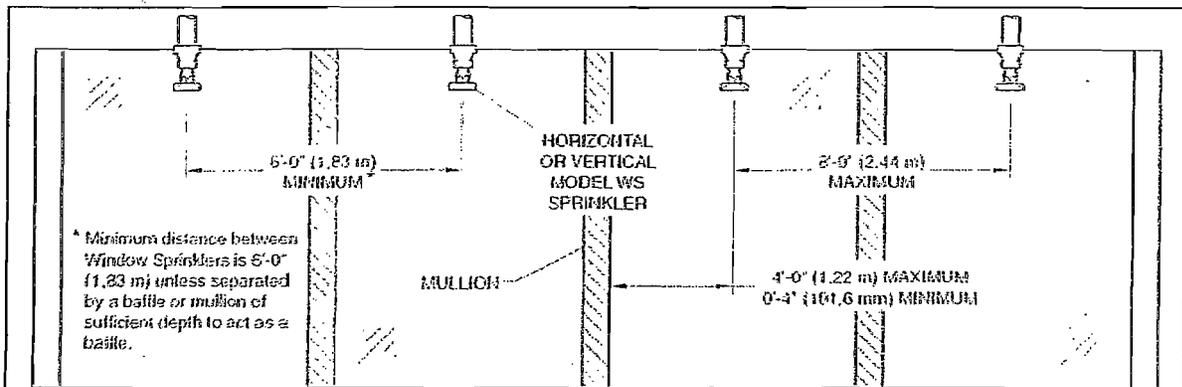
A-3 — EXTERIOR FIRE SEPARATION — SPRINKLERS OUTSIDE
